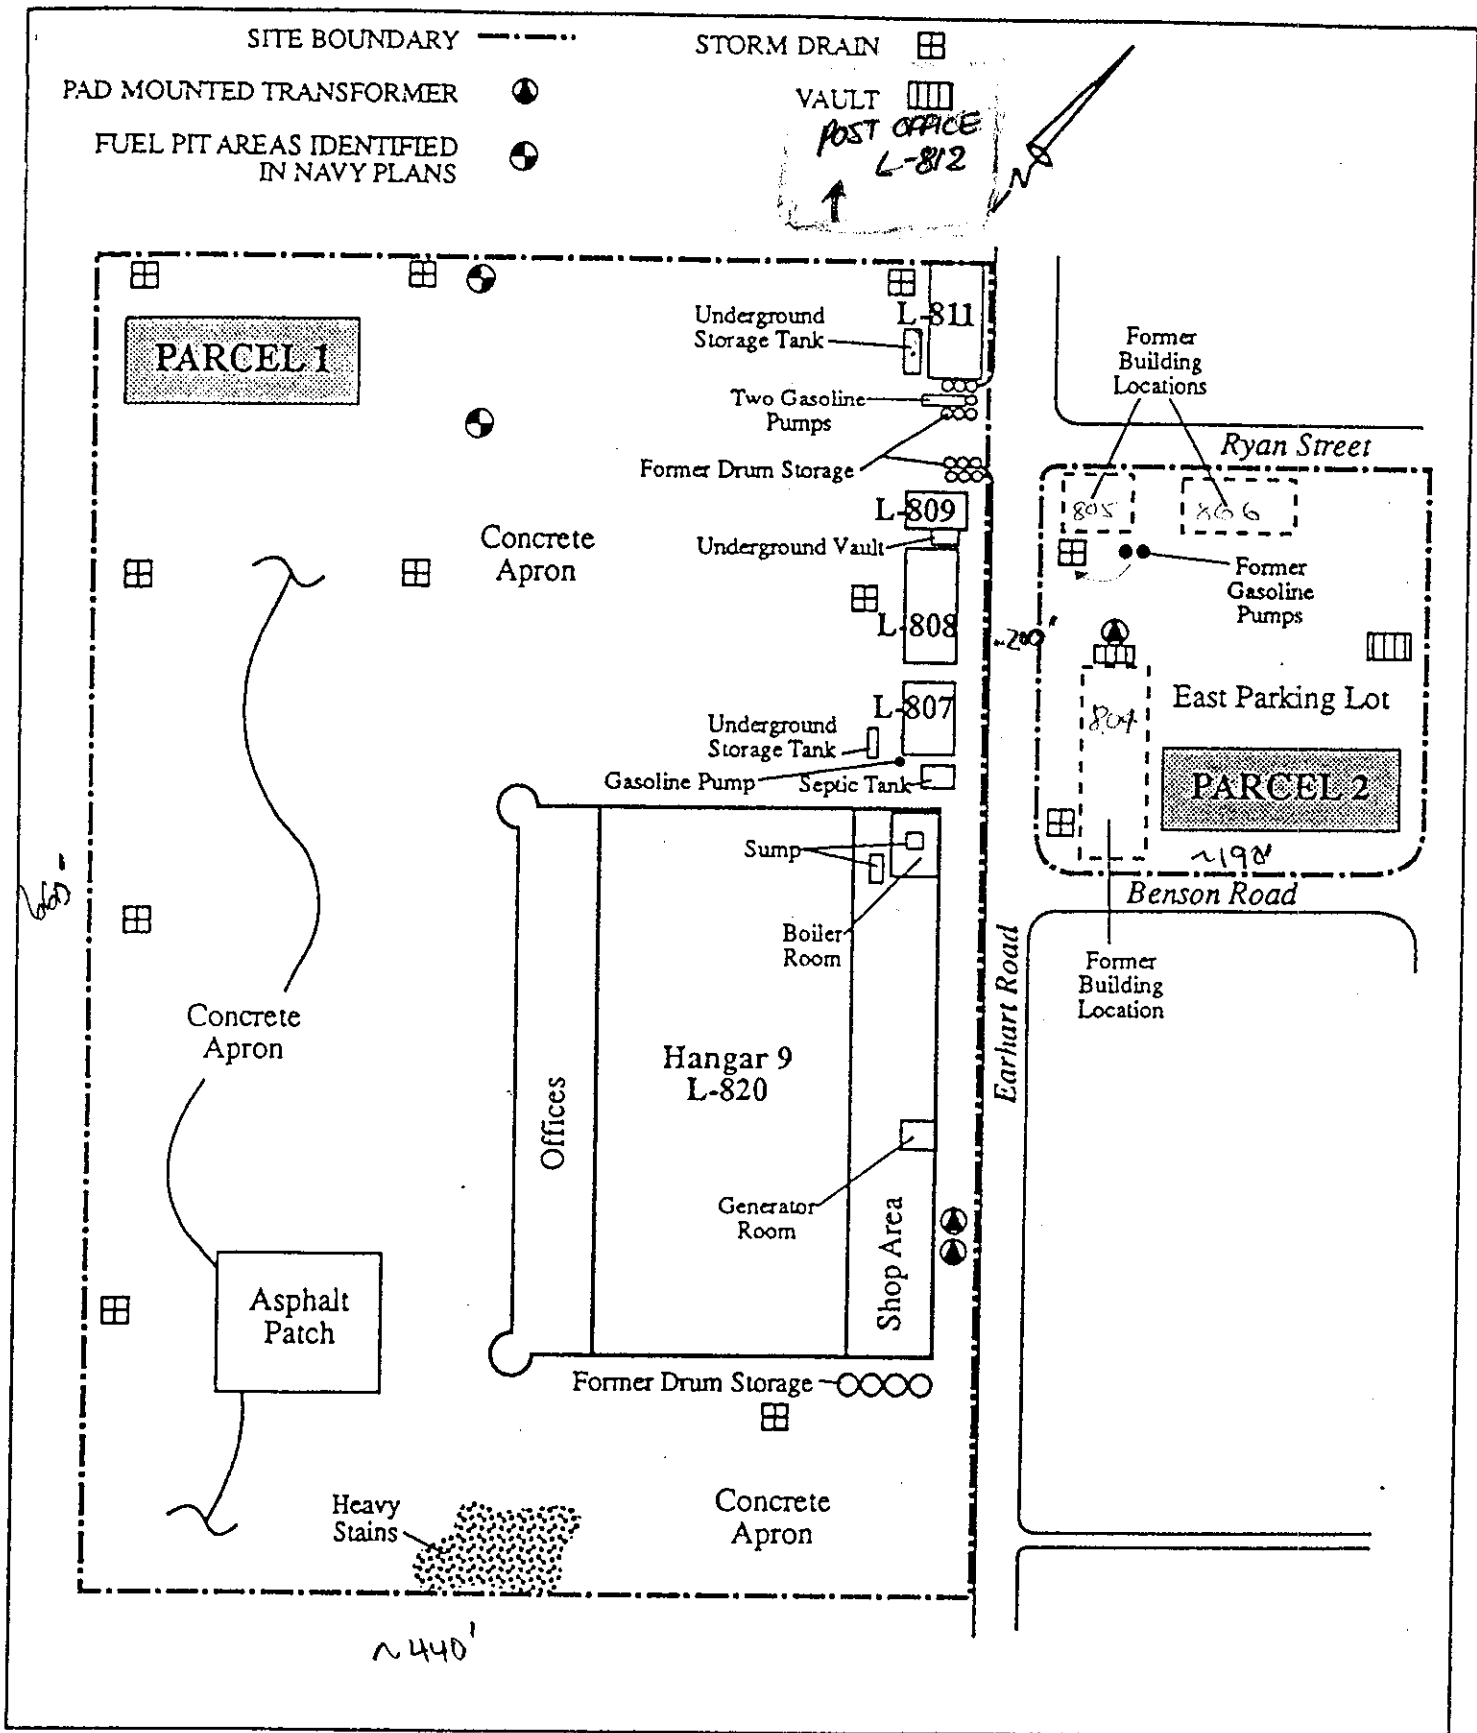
Hangar 9 Site Plan (Parcels 1 and 2)
